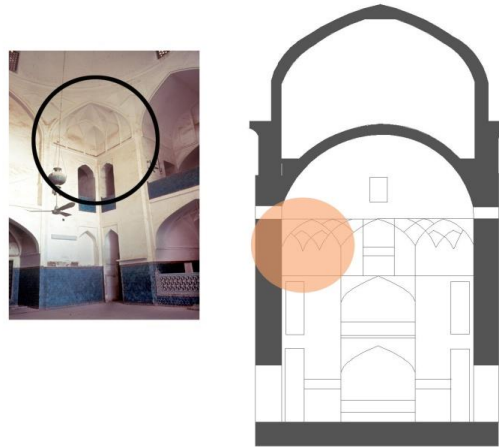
Transversal section, ref of measure drawing (Golombek et al., 1988)
